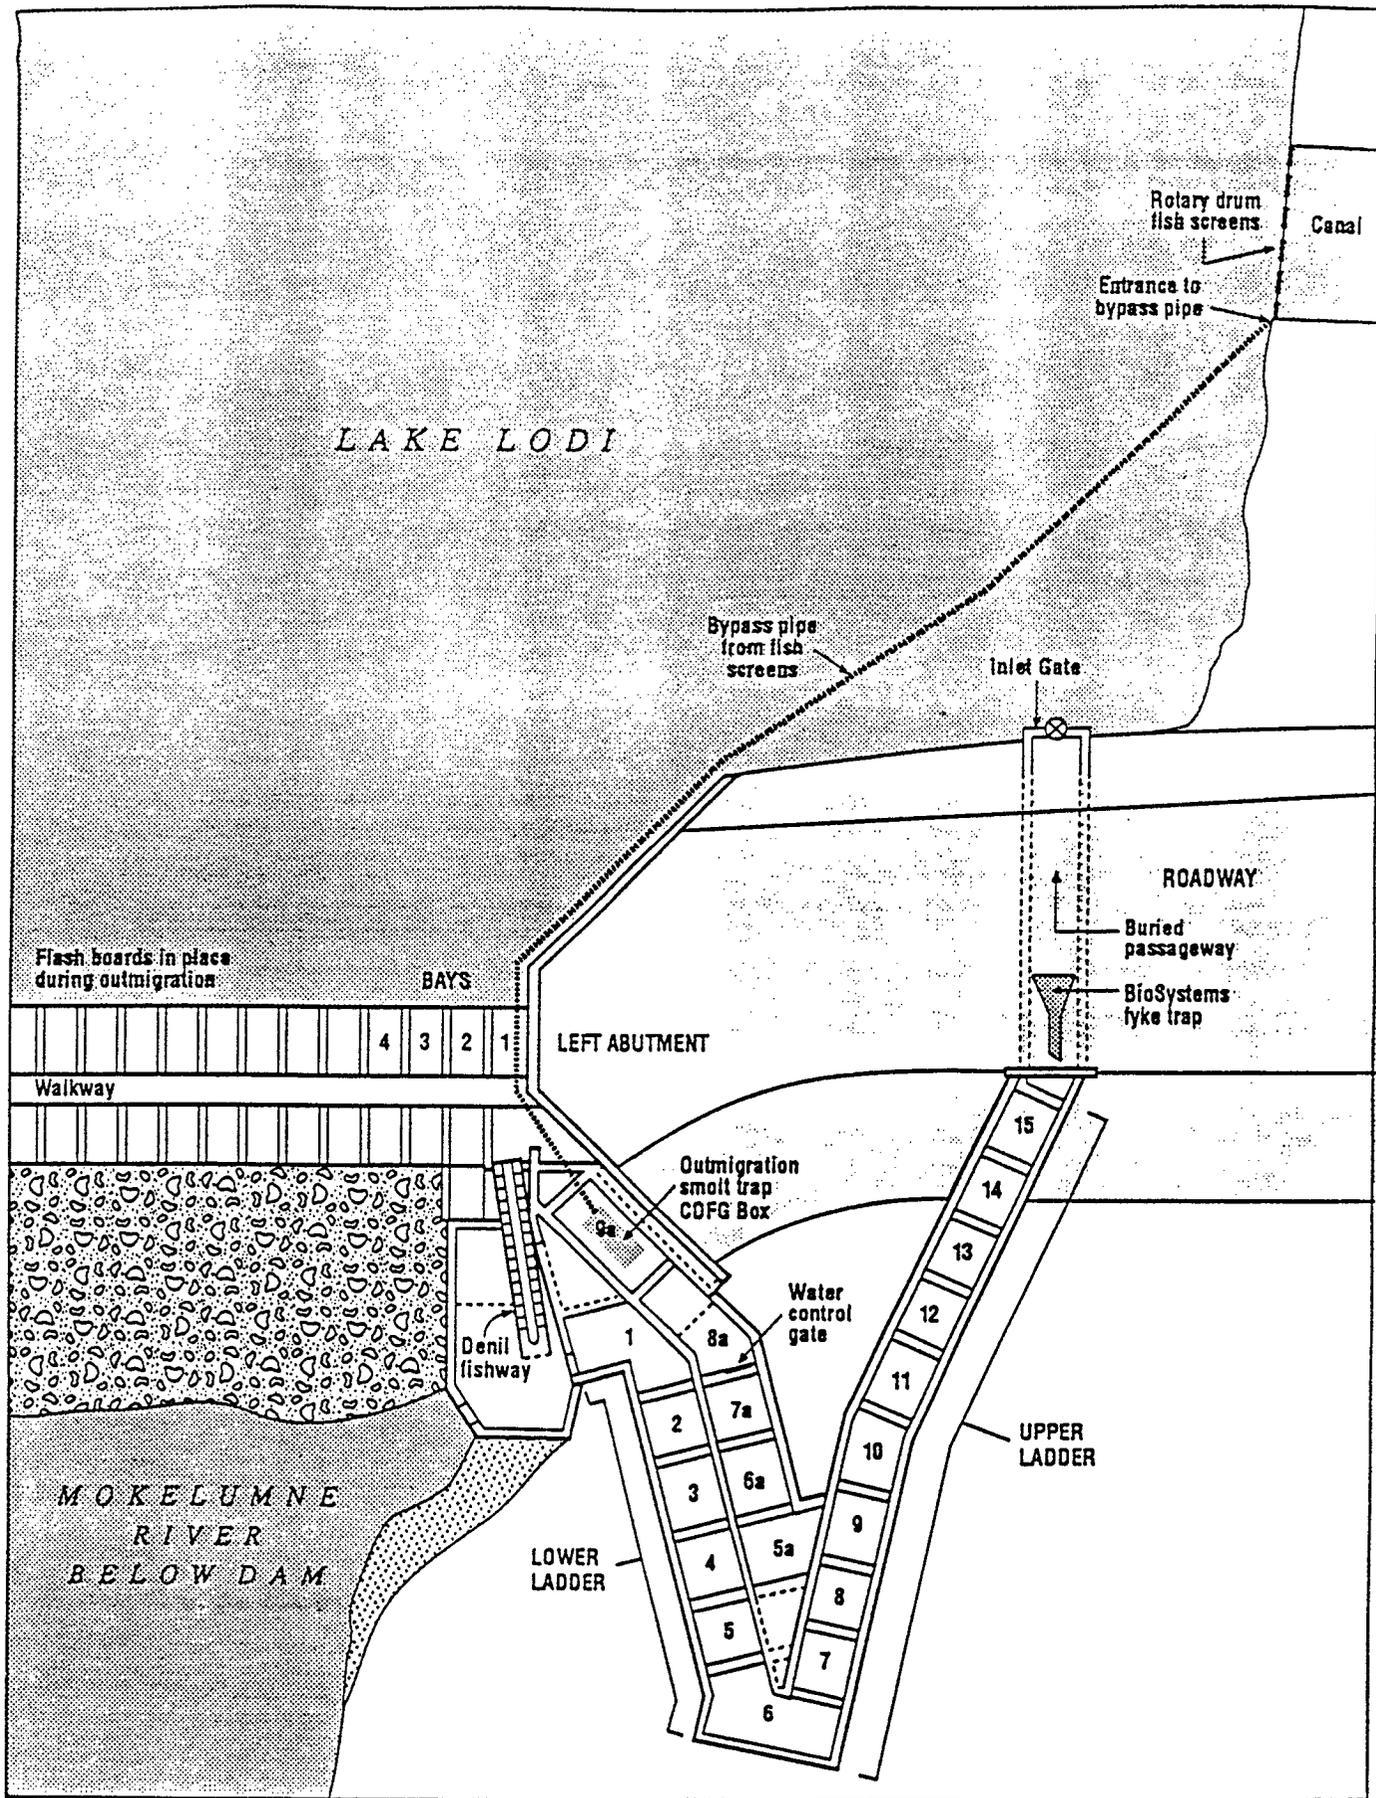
Plan view of Woodbridge Dam showing fish ladders, smolt outmigration traps: CDFG box and BioSystems fyke trap.
